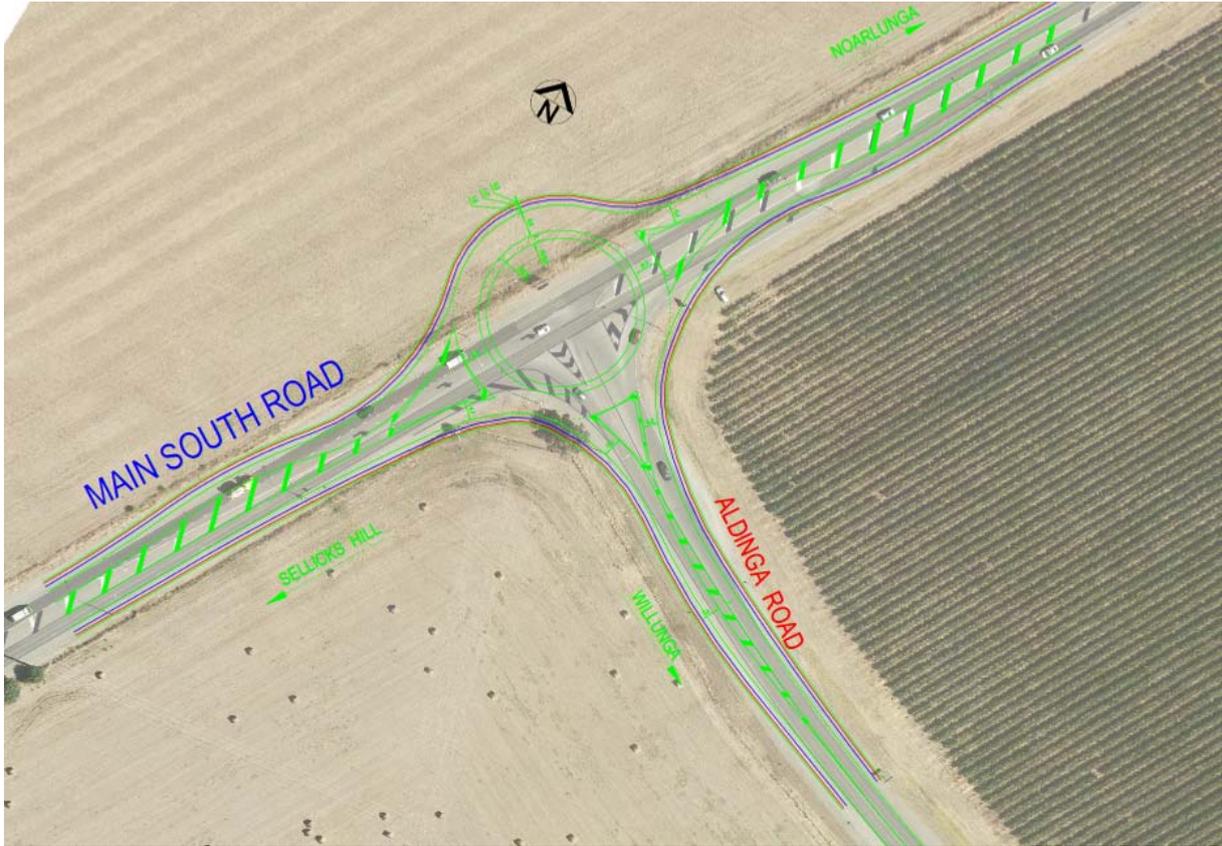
Proposed Upgrades for Aldinga Road Intersection: Option 1 Roundabout
